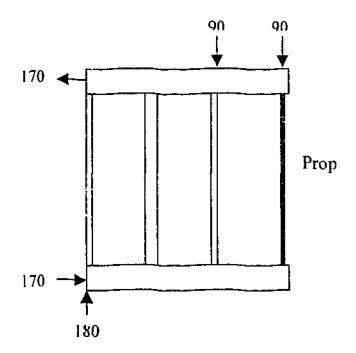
Load and Reactions on Experimental Model Wall Beam for Prototype Test (5 $Q_F^* kN$)
